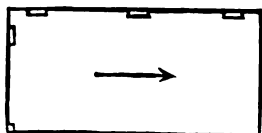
(Light superabundant.) Room 32x18, windows advantageously placed, glass area = 1-5.3 of floor area, and the room looks fully upon the sky.
